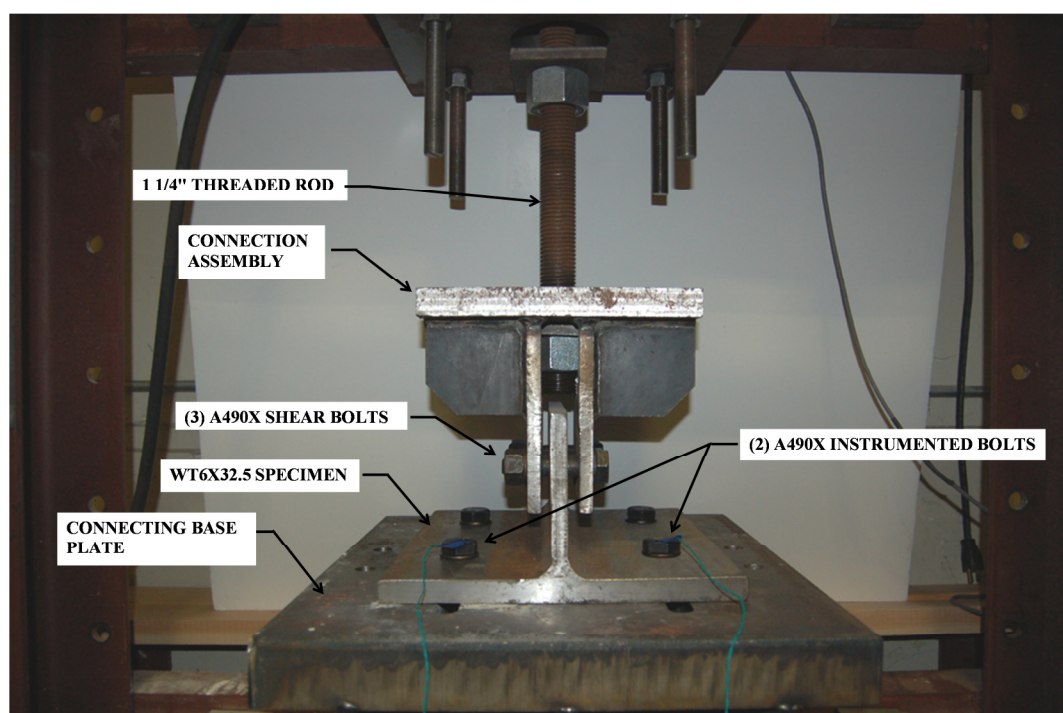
Fully Bolted Assembly of WT6x32.5.
